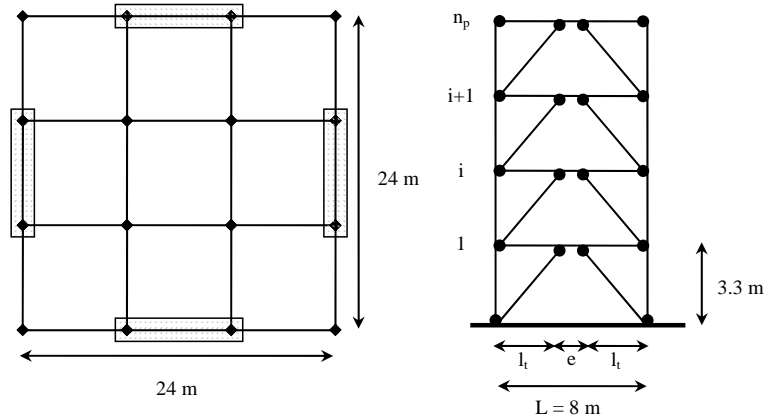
Plan and frame structural scheme of the Eccentric Braced Frames
